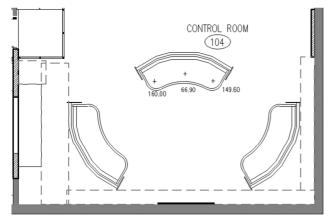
Control Room "B" plan with furniture layouts and light levels.
